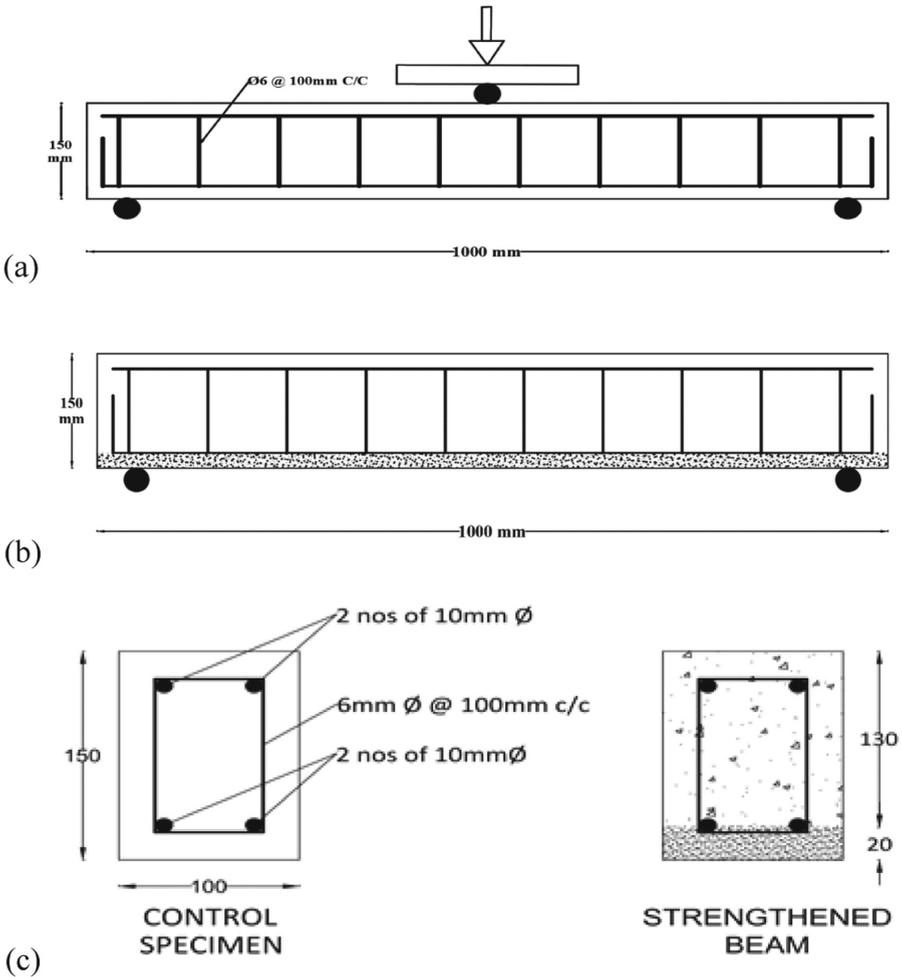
Beam specifications-(a) Control specimen; (b) Strengthened beam; (c) Sectional view.
